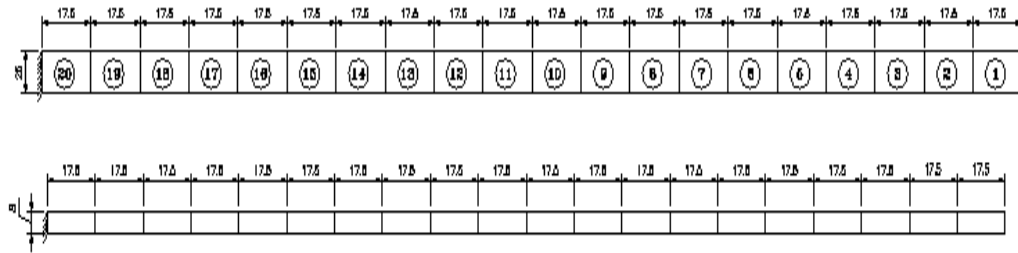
Plan and elevation of the undamaged cantilever beam
